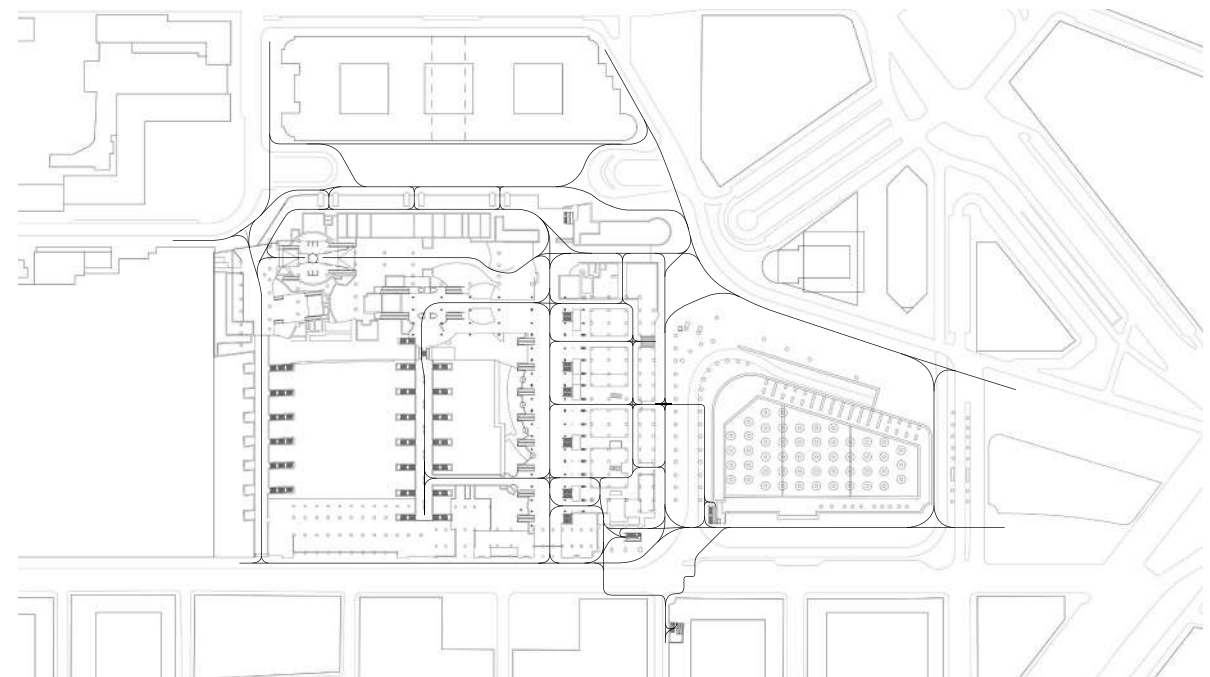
Plan of Brussels-South, showing the disconnected walkway and removed entrance
